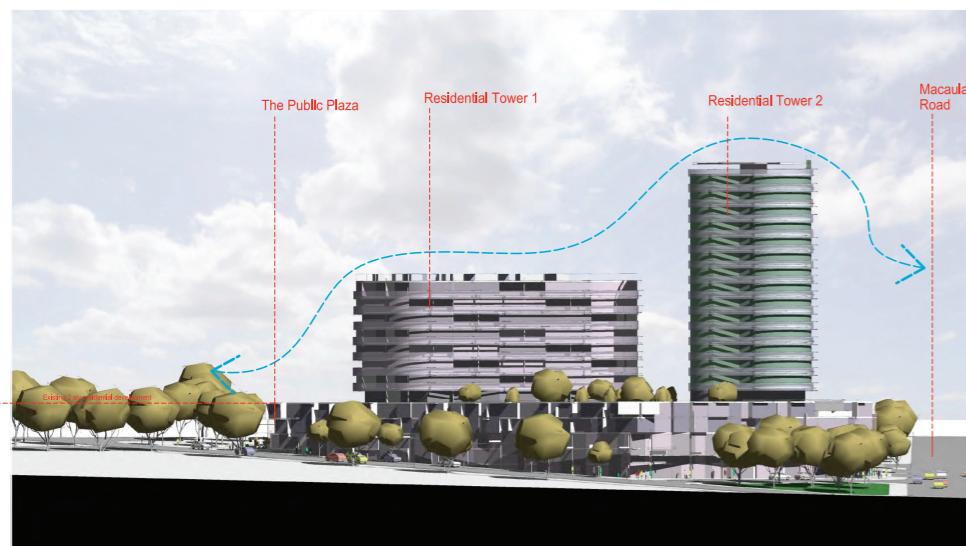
Canning Street & Vaughan Terrace corner elevation.
